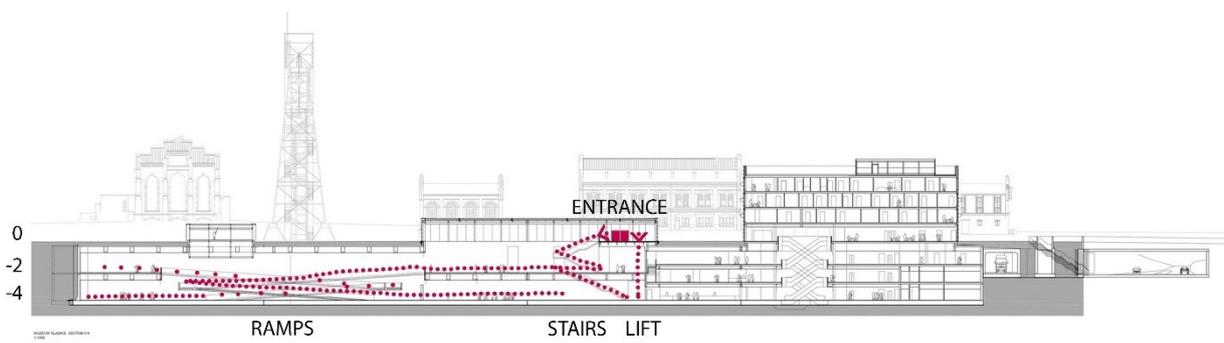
Silesian Museum in Katowice, Poland: Longitudinal section. (Source: Floor plan by Riegler Riewe Architekten with markings by Filová, 2021)
